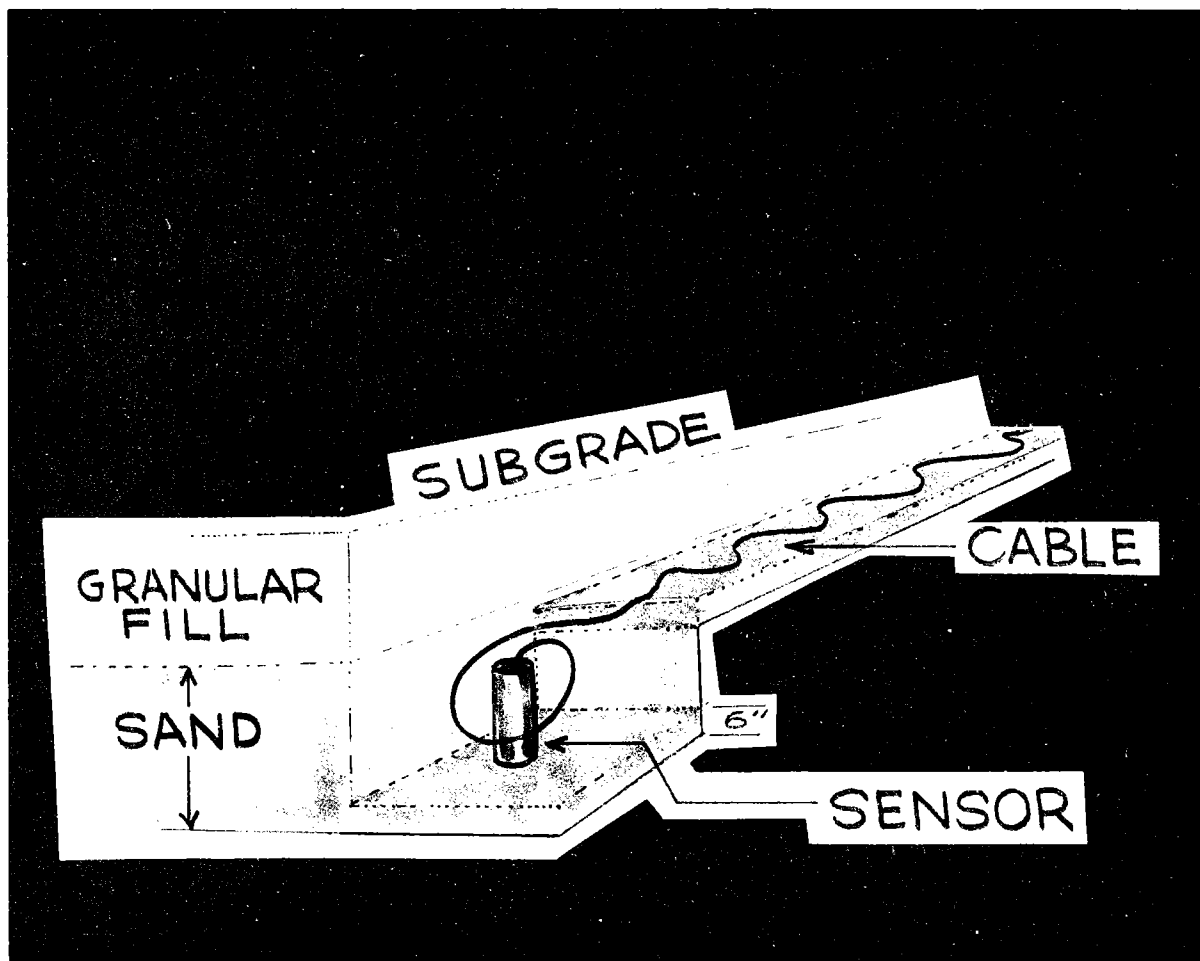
The sensors and cable are protected with a six-inch cover of sand. Where the cables cross shear zones, they are placed in open 30-inch nestable culverts.
